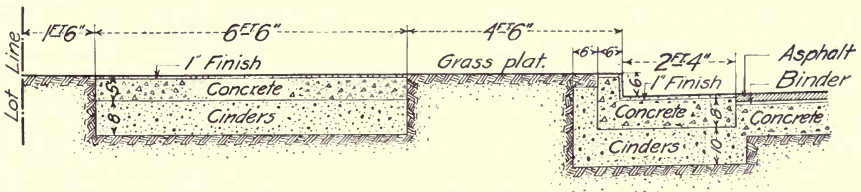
CROSS SECTION OF SIDEWALK AND COMBINED CURB AND GUTTER.
